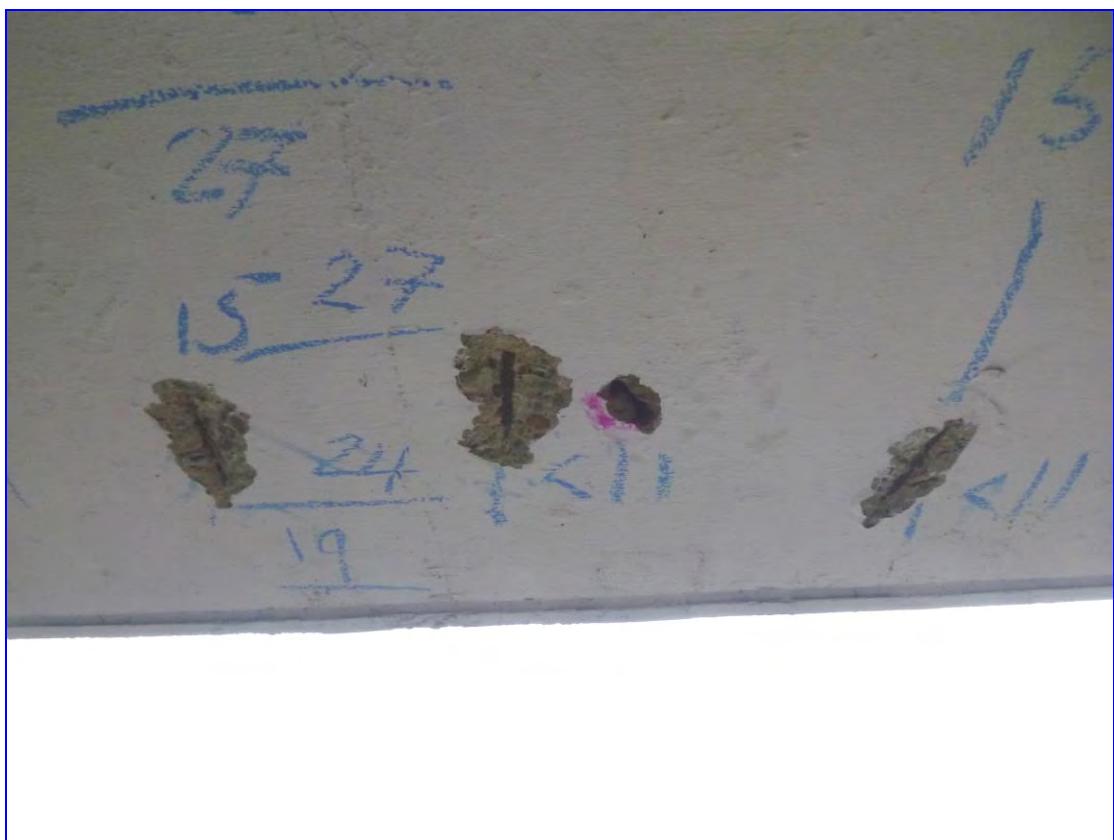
Spalling to roof beam on Kentmere House.
